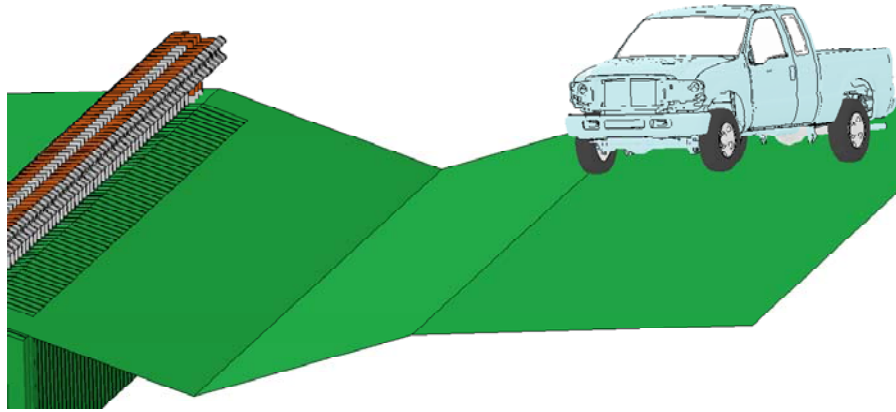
FE model of a backside impact on a lowered backside double-faced W-beam guardrail placed on a 2.5H:1V slope and impacted by a Ford F250.
